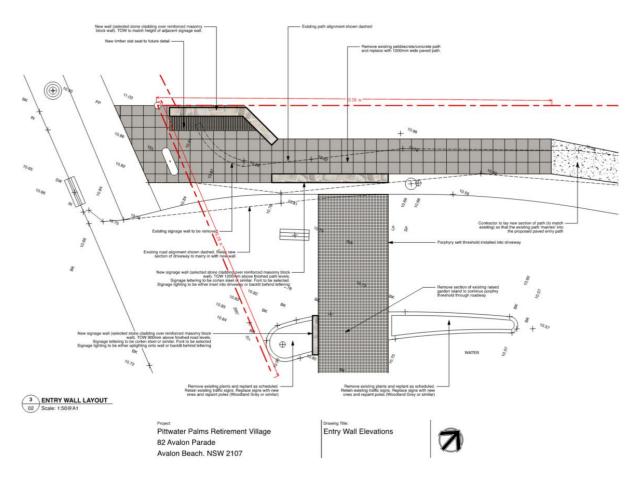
Proposed Development Plan (Stone Rose Landscapes, 16/02/2023)
